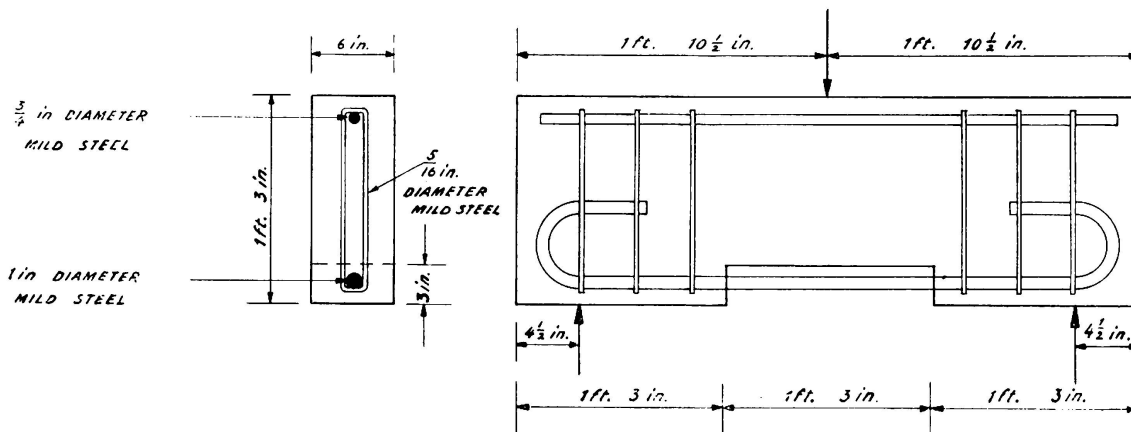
Dimensions and reinforcement of short beam with mild steel
